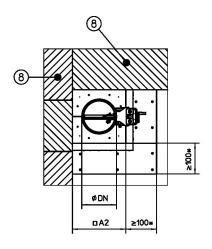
Installation remote from lightweight partition walls, wall penetration, cladding on three sides
